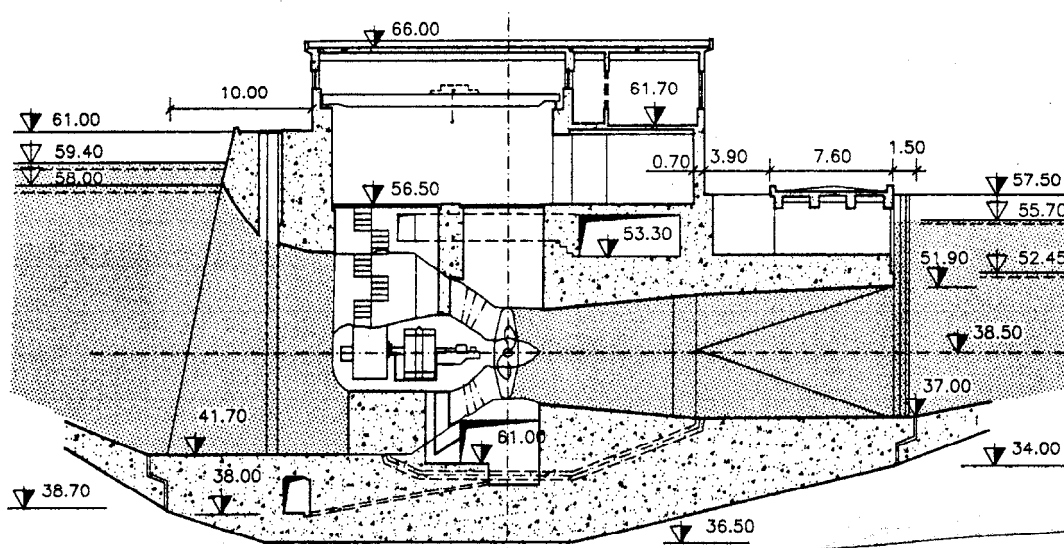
Cross Section of Powerhouse and Bottom Outlet of Rohri HPP.
